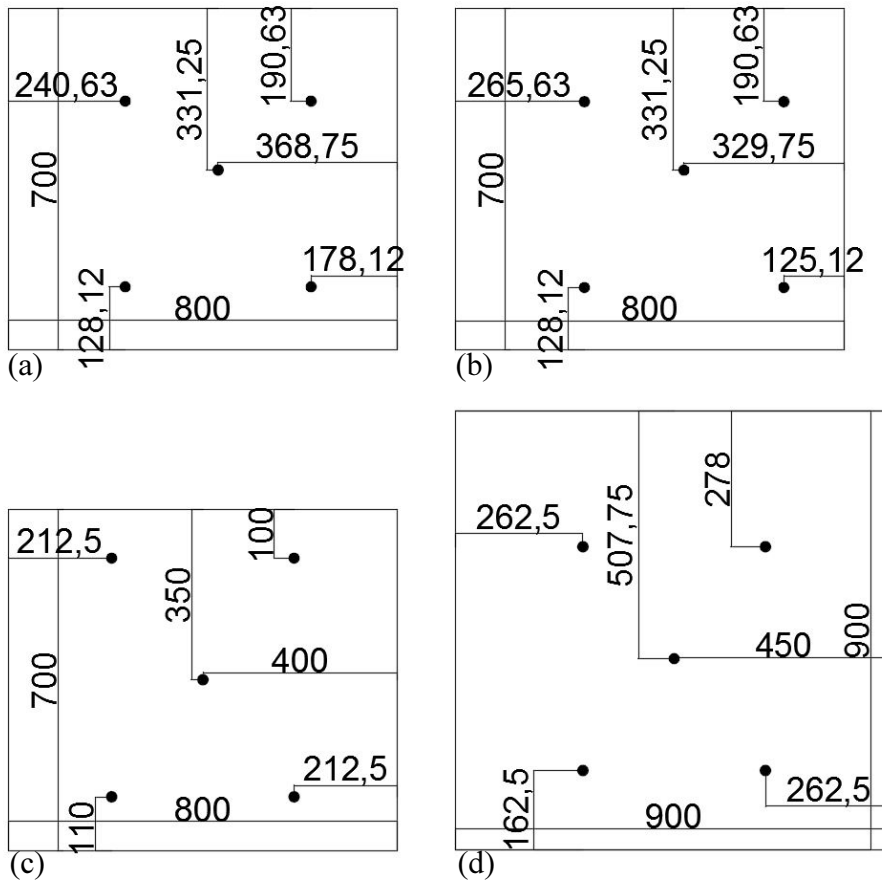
In-depth thermocouple layouts for (a) exposed back wall for configuration α ; (b) exposed side wall for configuration α ; (c) exposed back wall for configuration β ; (d) exposed ceiling for configuration β . All dimensions in mm from timber-timber interfaces (encapsulation not considered).
